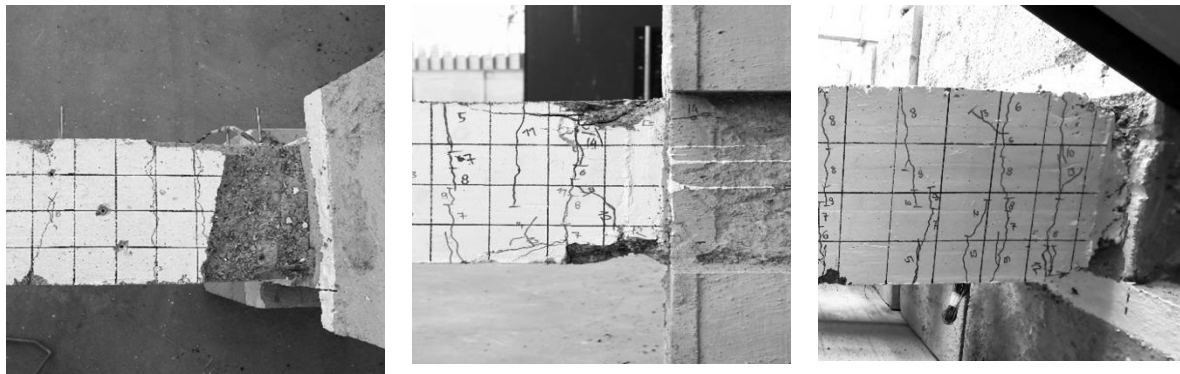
Crack propagation in columns: a) REF column; b) R10-1 column; c) R15-2 column
